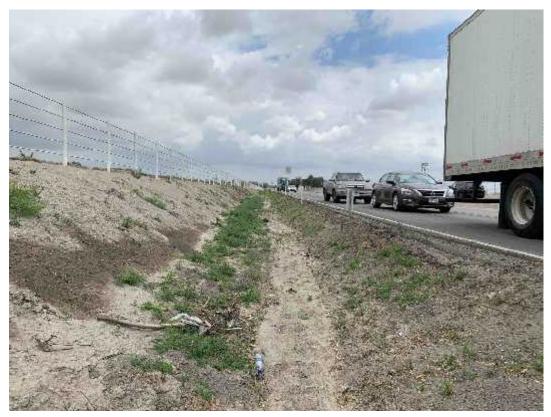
Drainage 1 looking east (upstream) near the corner of Merrill Ave and Euclid Avenue.
